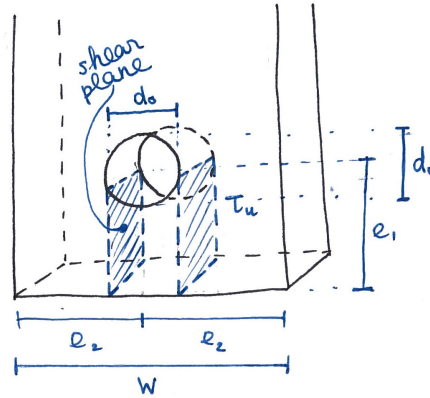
3D printed plate with bolt hole. Shear surfaces of tear-out in blue.
